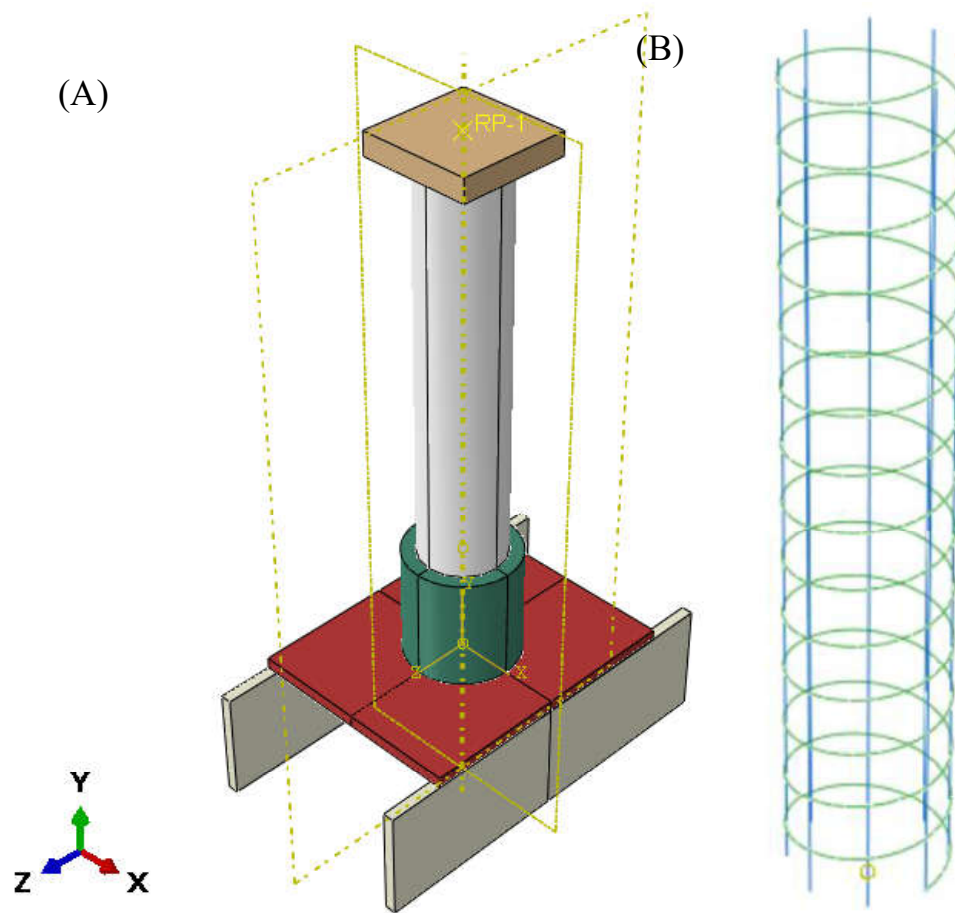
The assembled parts (A) steel reinforcement (B) the concrete model.
